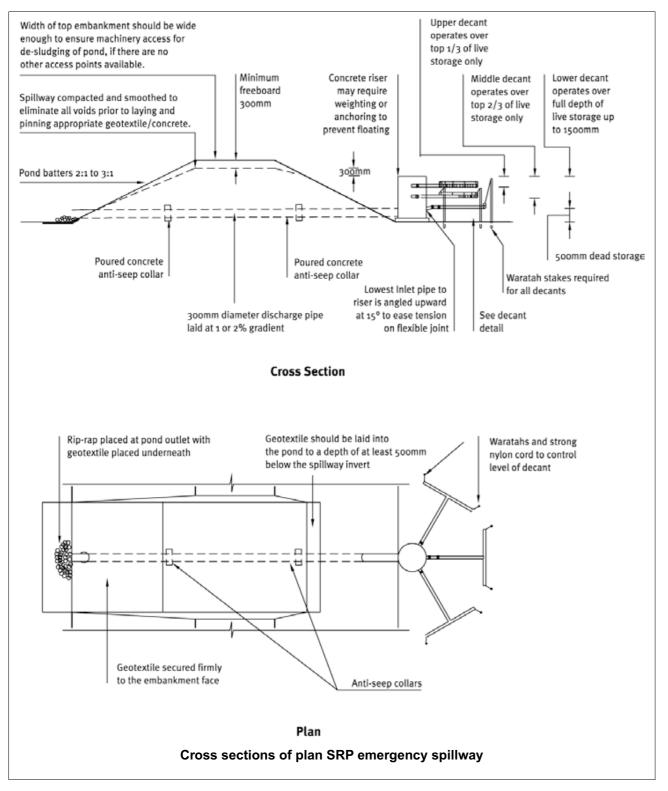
Schematic of a Sediment retention pond - Cross Section of plan SRP emergency spillway
